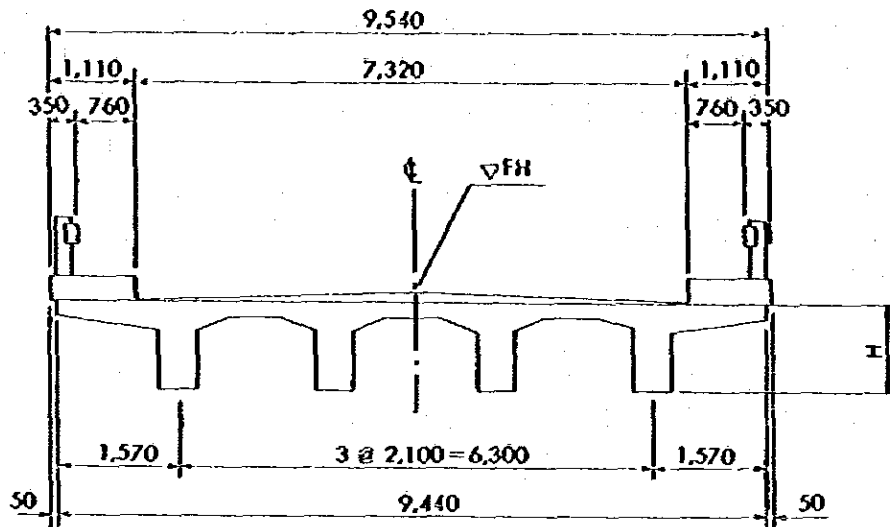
TYPICAL CROSS-SECTION FOR BRIDGE
